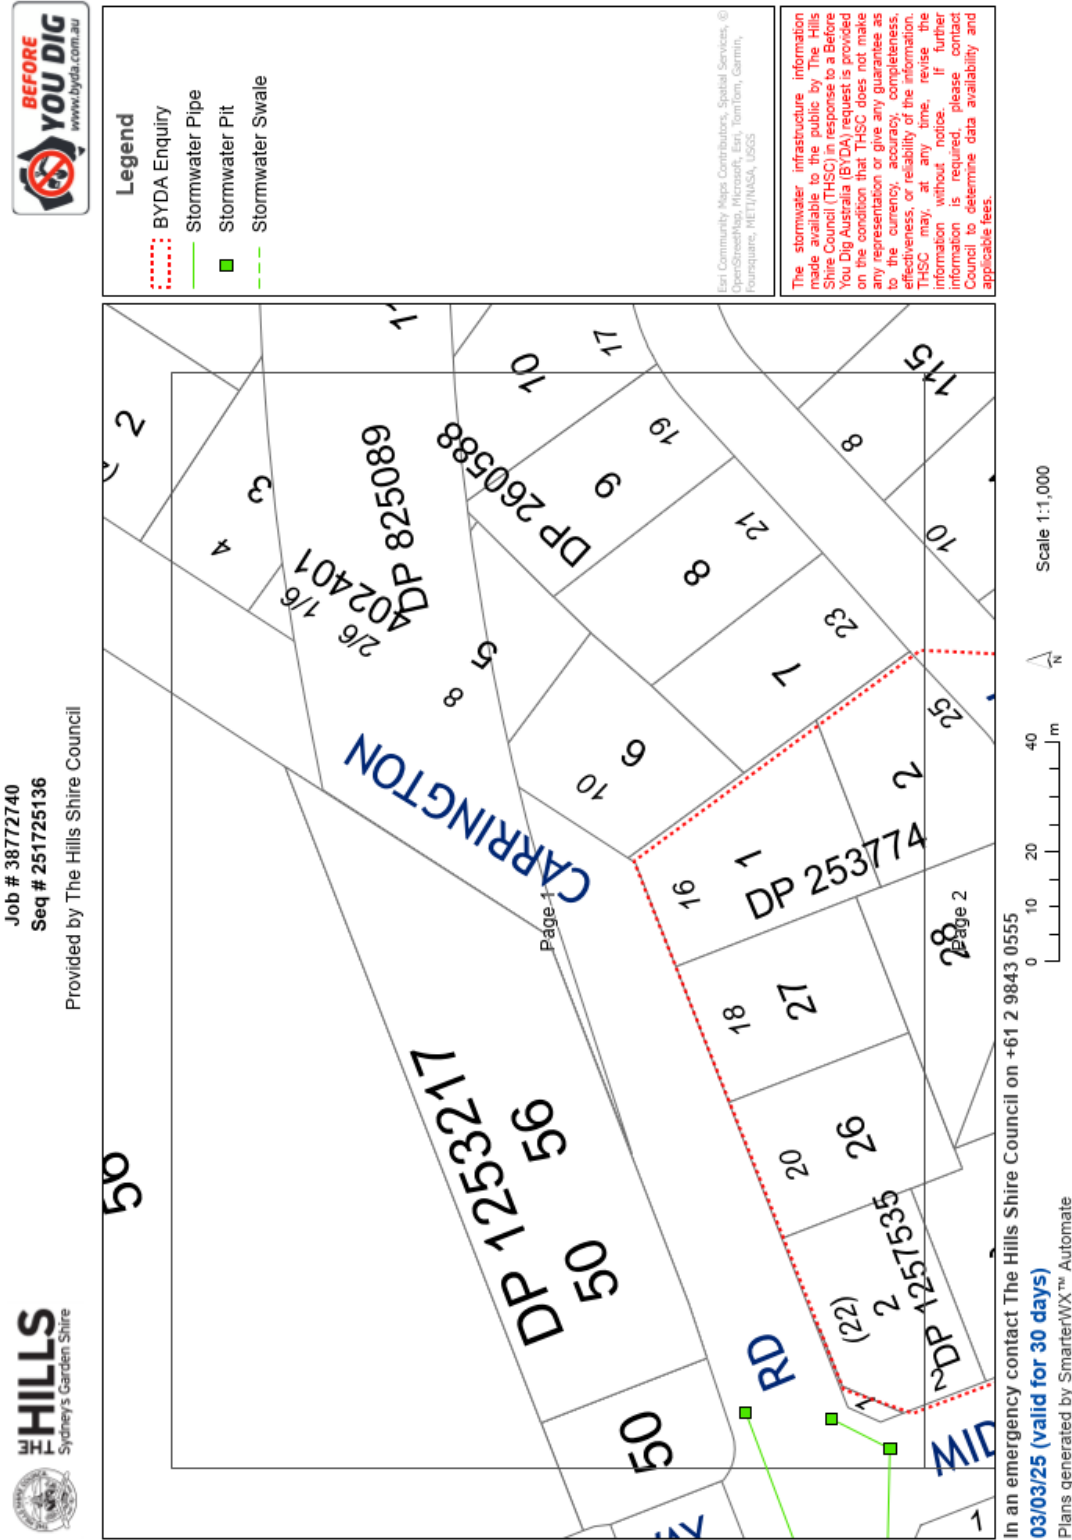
Hills Shire Council – Stormwater Infrastructure Plan 2
